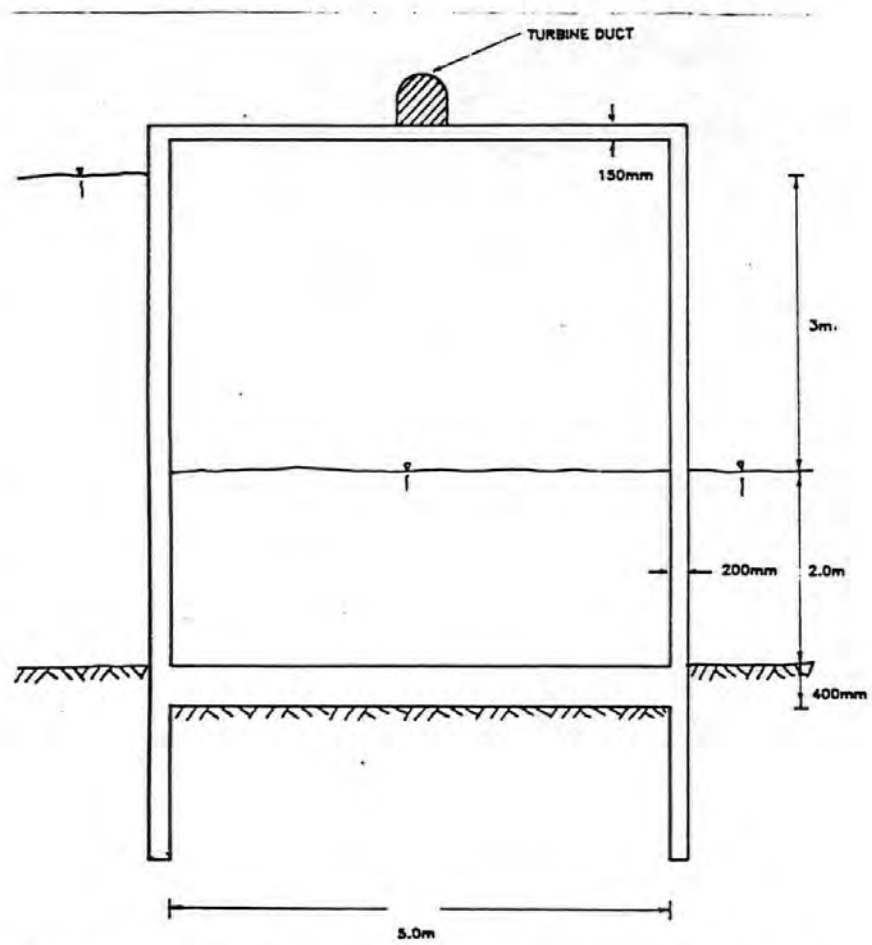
IN-SITU CONCRETE SYSTEM USING COFFERDAM -
